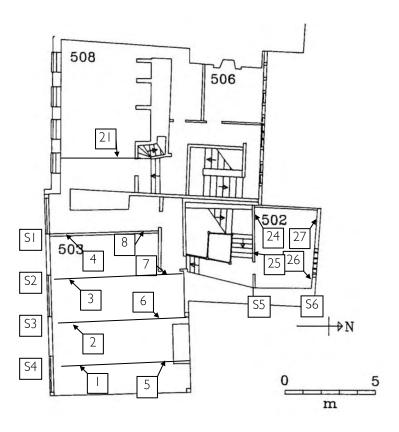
Plan of Level 5 of Bessie Surtees House showing the location of rooms 502, 503, and 508, the truss numbering scheme assigned to the Surtees House roof trusses SI-S6, and the approximate location and direction of samples I-8, 21, and 24-27. Based on Figure 8 of Heslop et al (1994)
